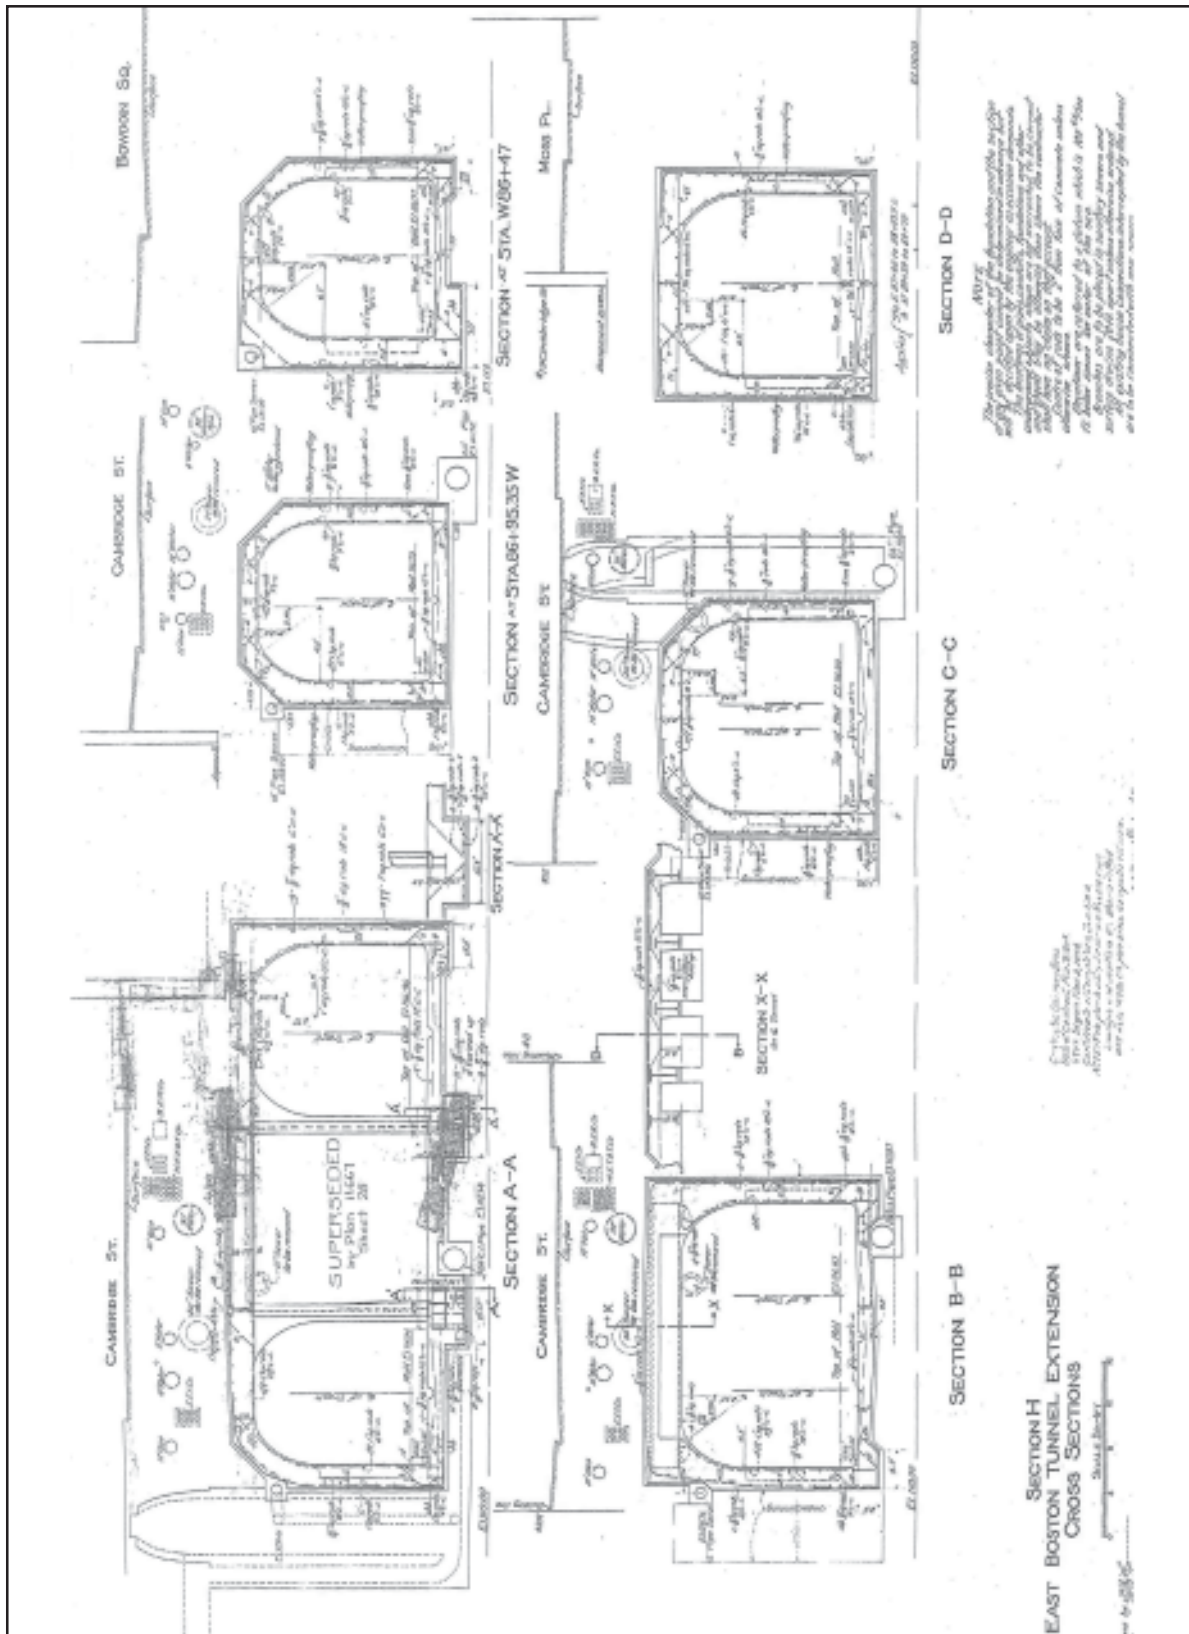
1914 plan of the East Boston Tunnel Extension showing typical tunnel cross sections (source: BTC 1913–1914).
